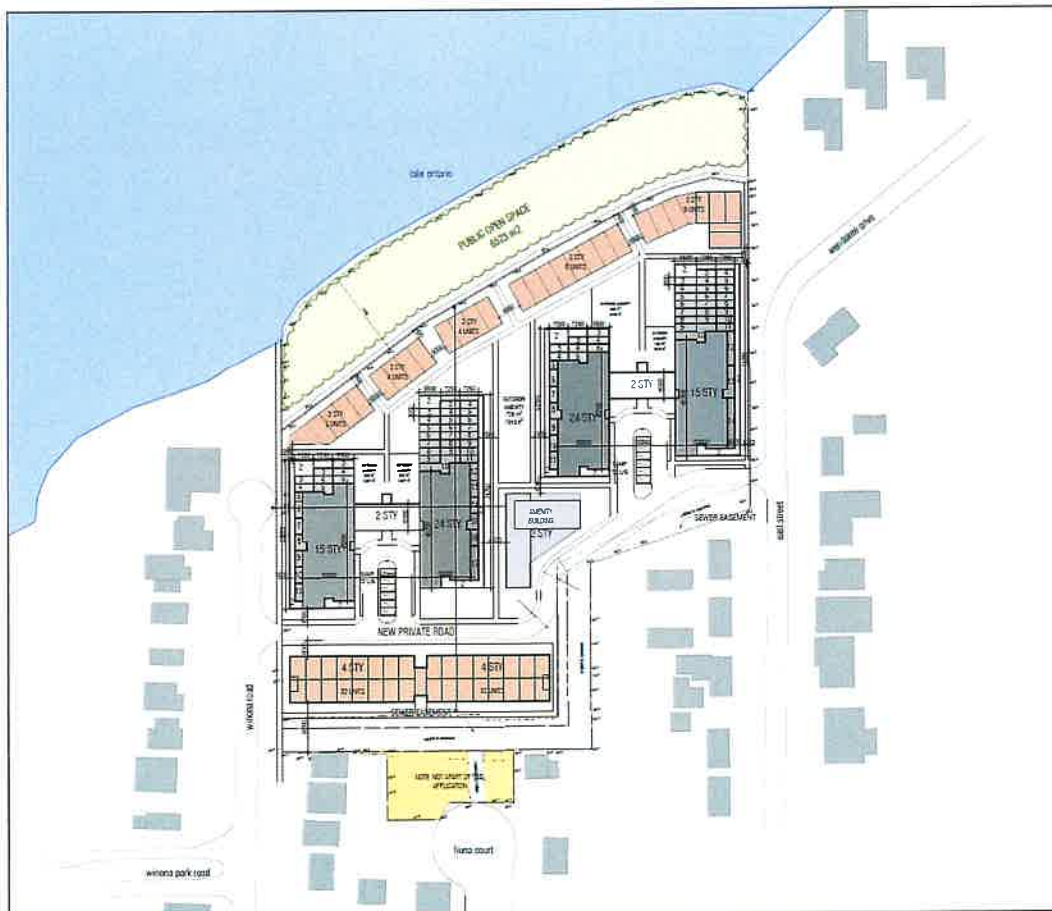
Concept Plan illustrating proposed public shoreline open space
